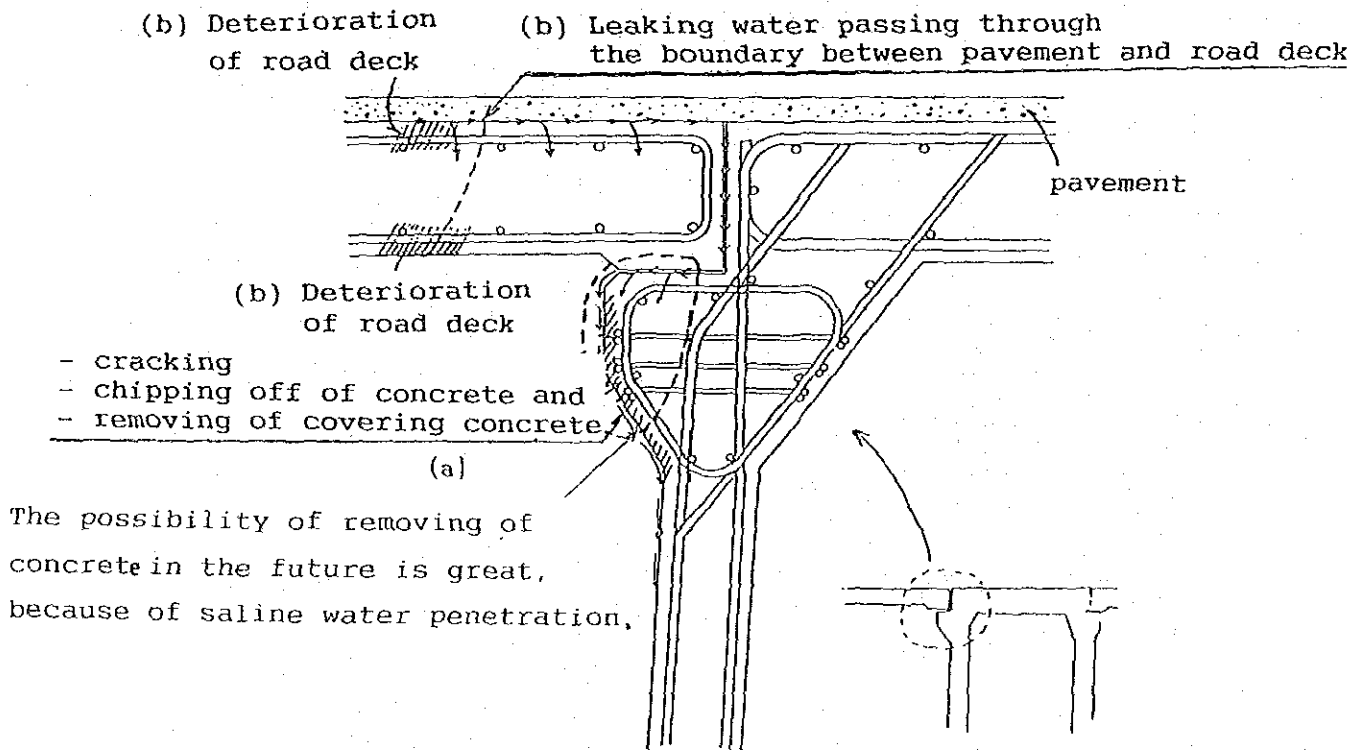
Covering Concrete Damage at Road Deck and Support Wall
